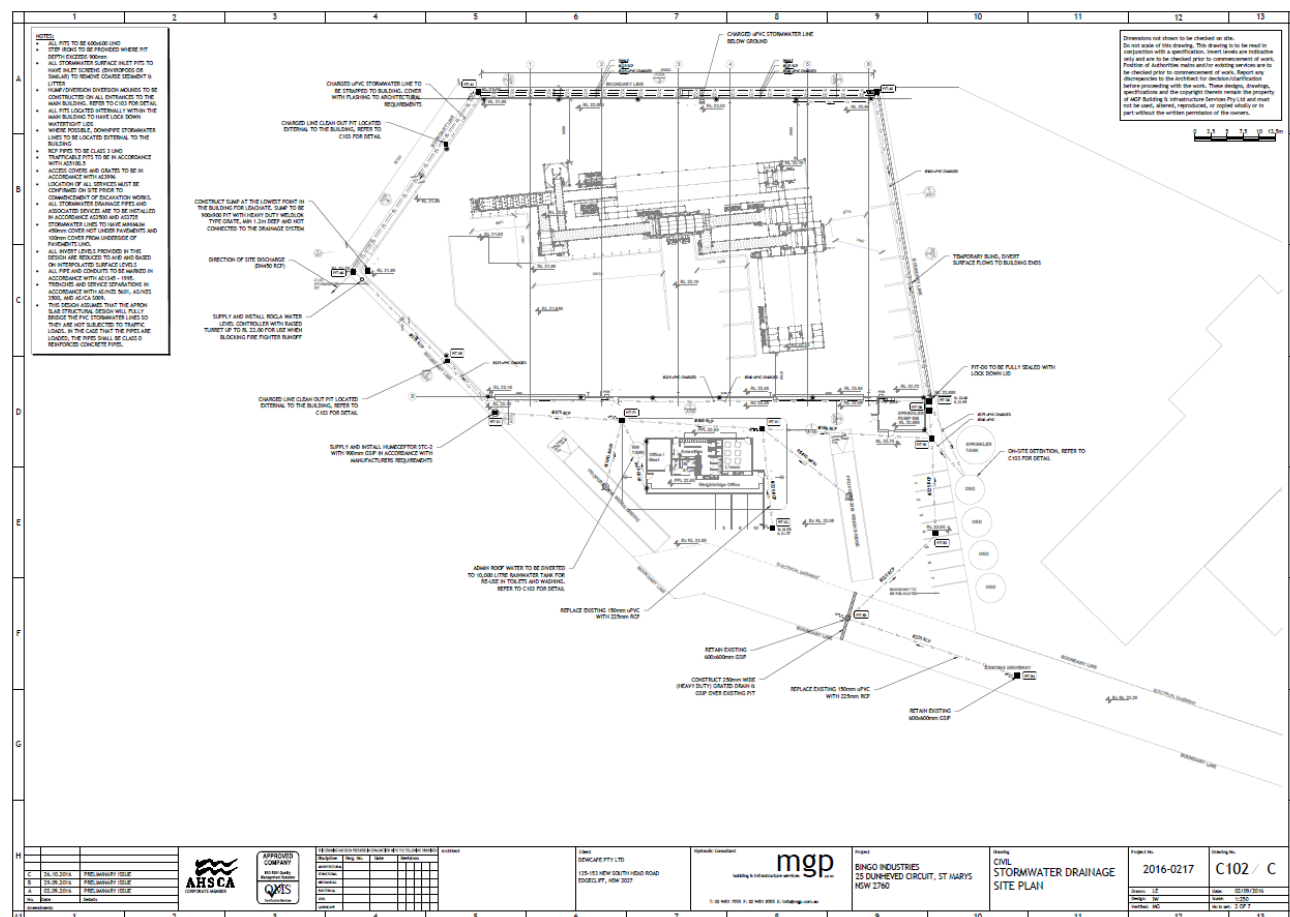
Stormwater Drainage Plan for the Existing Site
